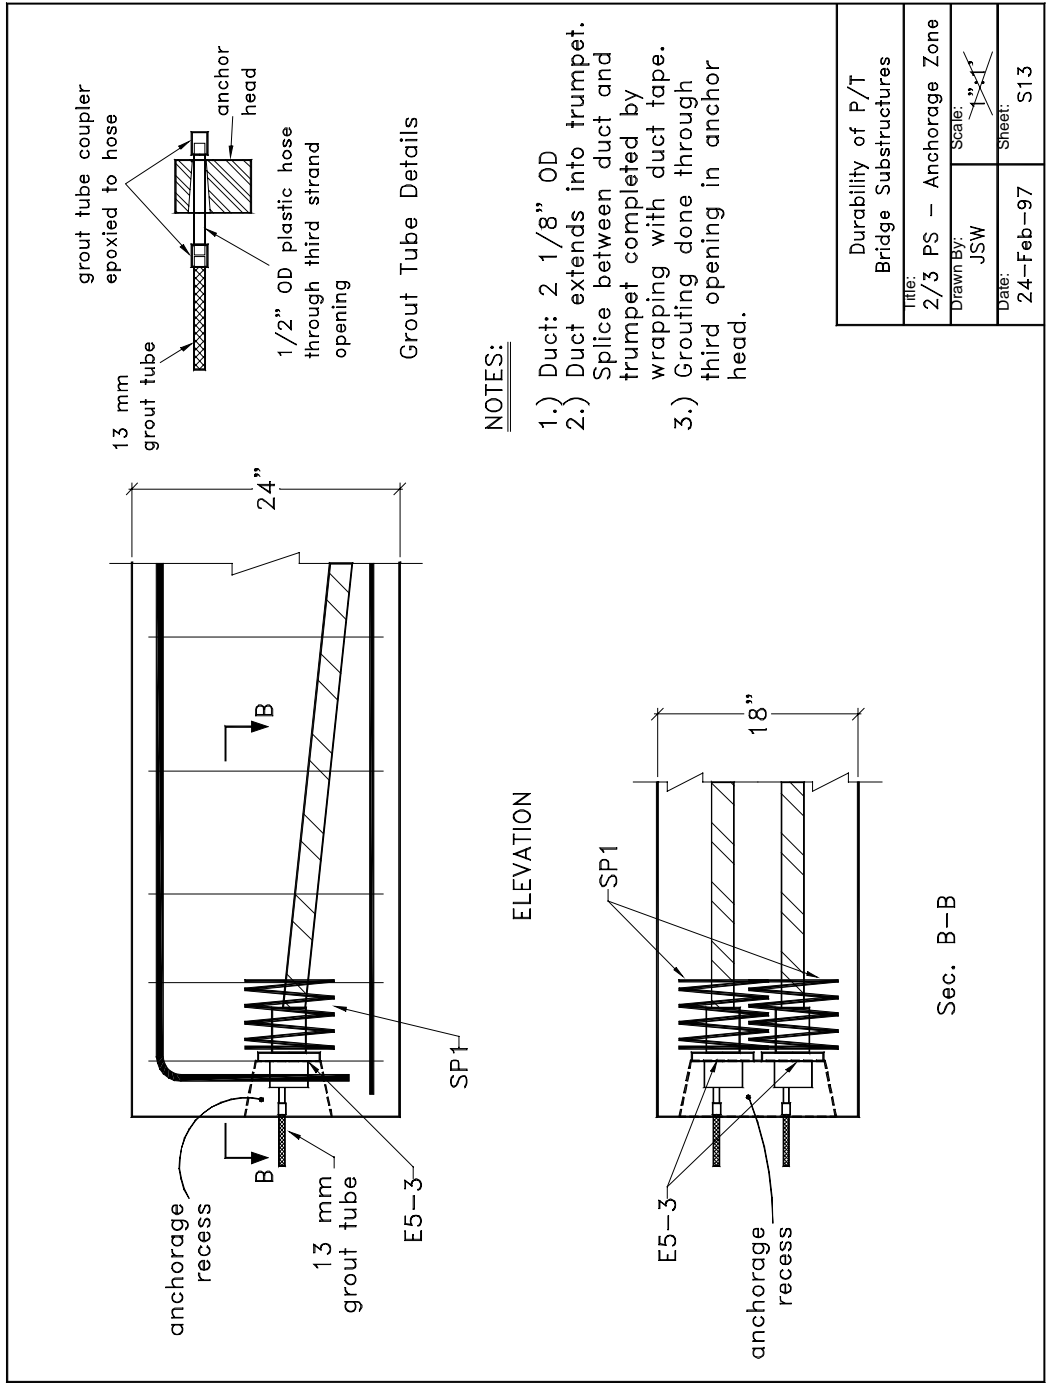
Sheet S13: 2/3 PS Anchorage Zone
